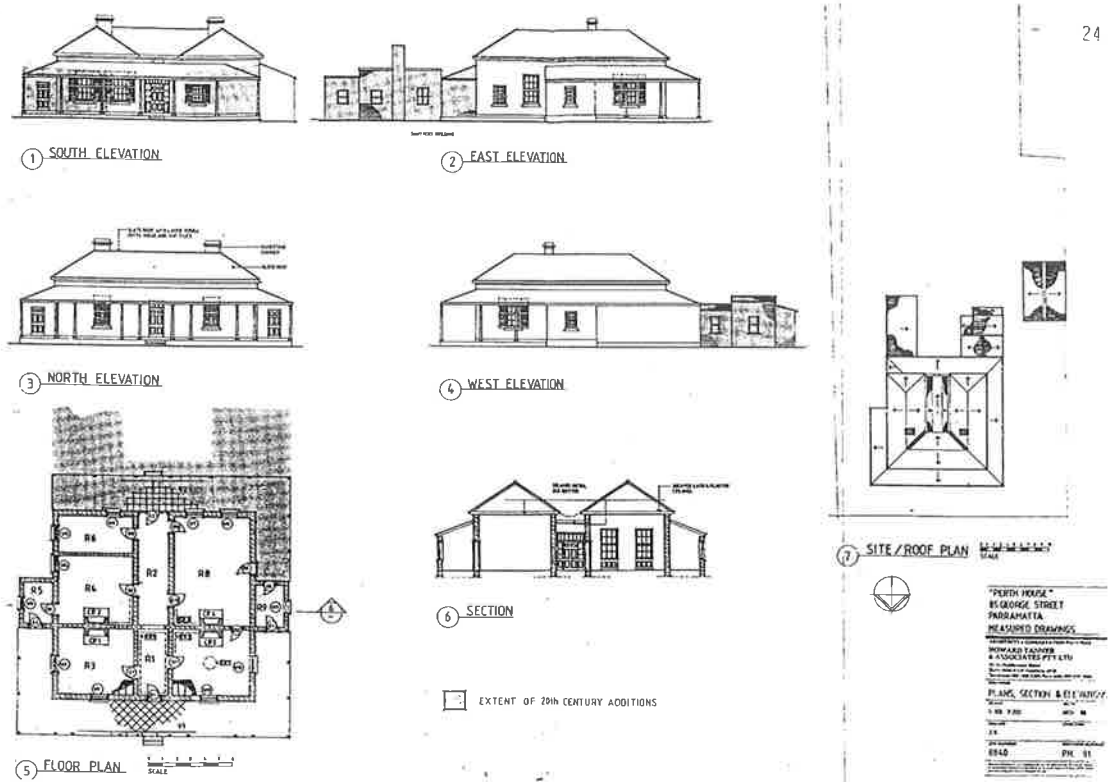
"Perth House" - Stables, 85 George Street, Parramatta – Measured Drawings Plans, Section and Elevations. Prepared by Howard Tanner & Associates, Nov 1988
